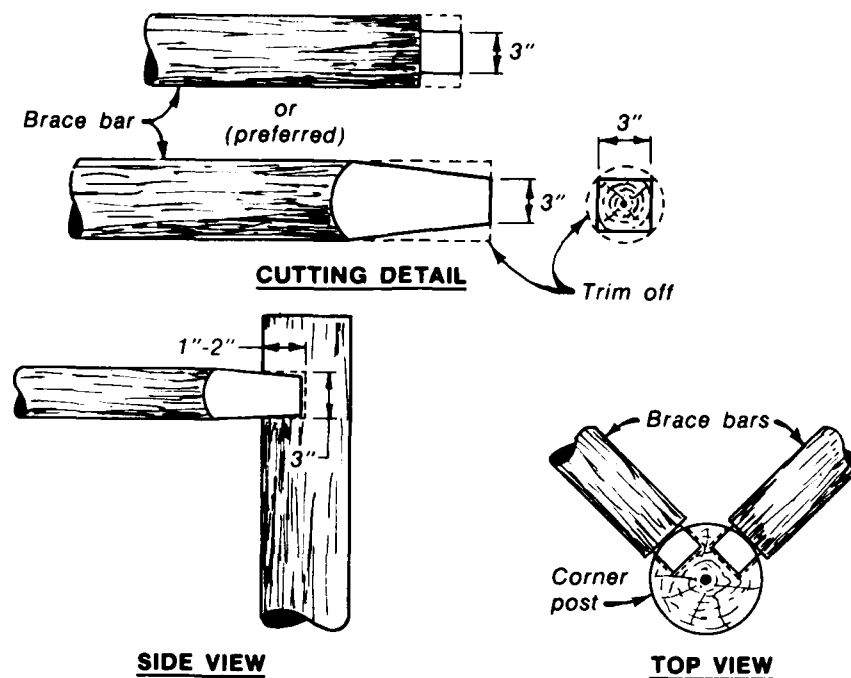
Cutting detail and installation of brace bar. Brace bars are connected to corner posts and corner brace posts
